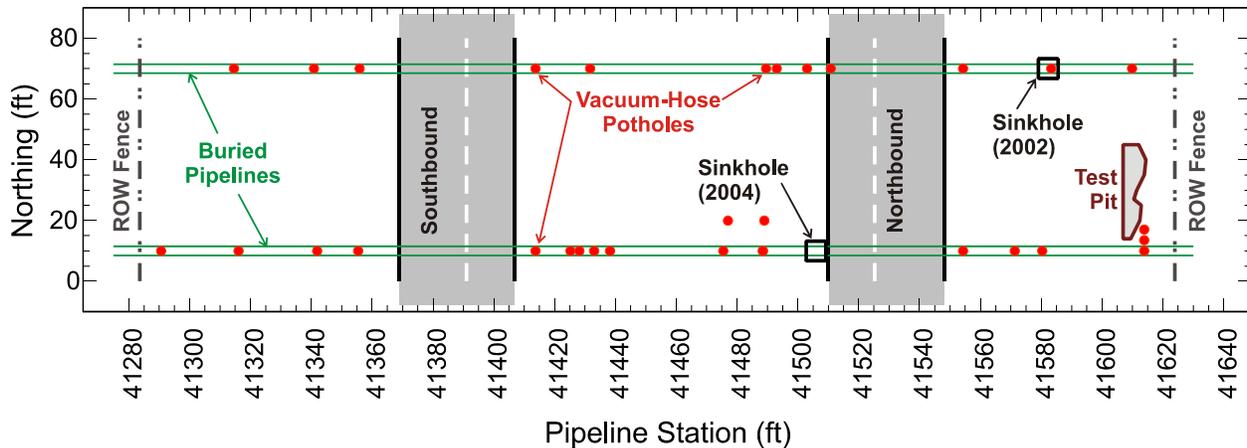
Layout of highway and buried pipelines showing locations of sinkholes, investigation potholes, and test pit.
